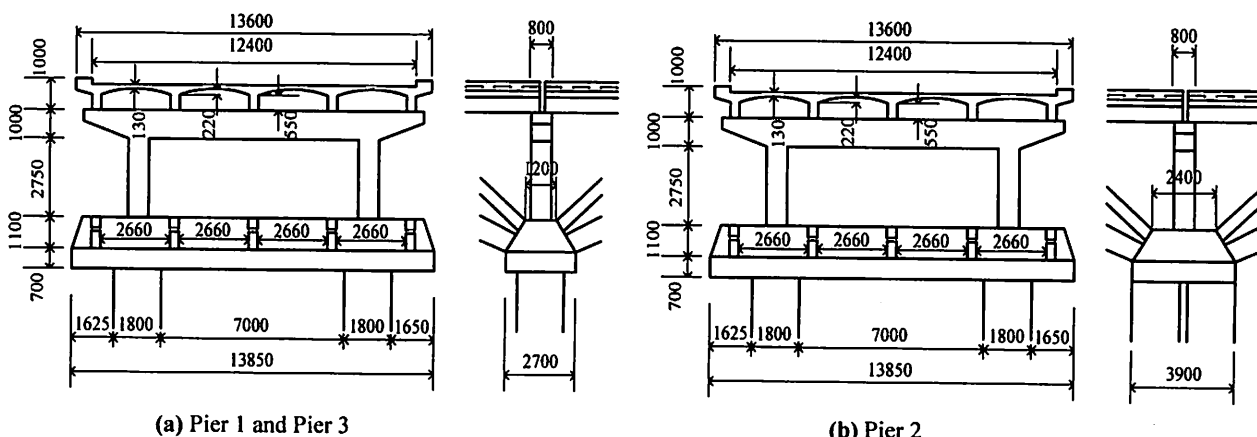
Assumed Dimensions of Piers Based on the Survey (unit: mm)
